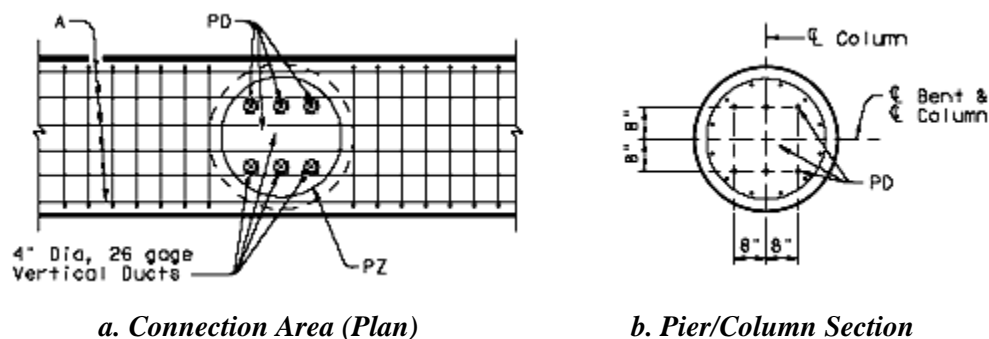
Lake Ray Hubbard Bridge Project – Placement of Connectors Relative to Pier Section
